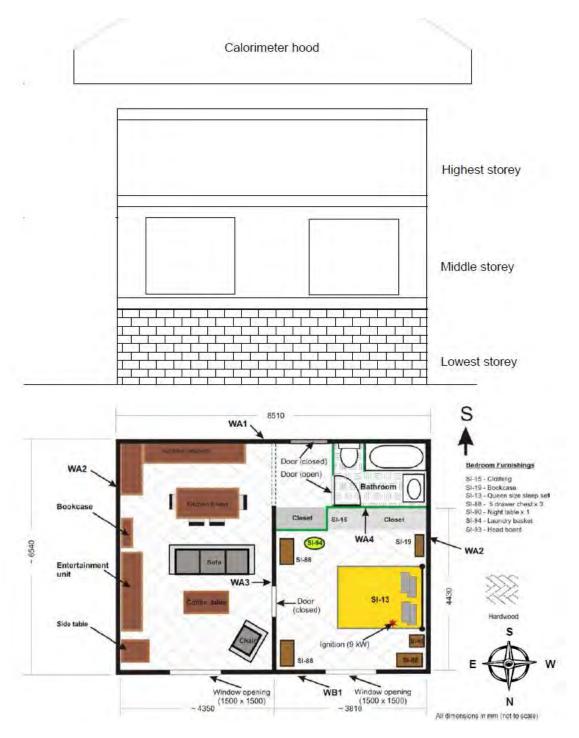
Large-scale compartment test setup, from Su and Lougheed (2014)
